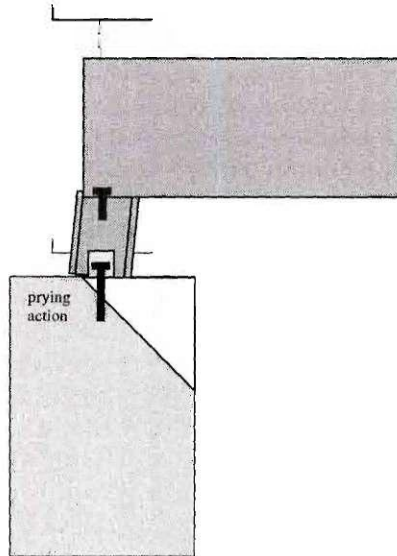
Side-view schematic of concrete breakout for anchors close to the edge of the concrete pier
